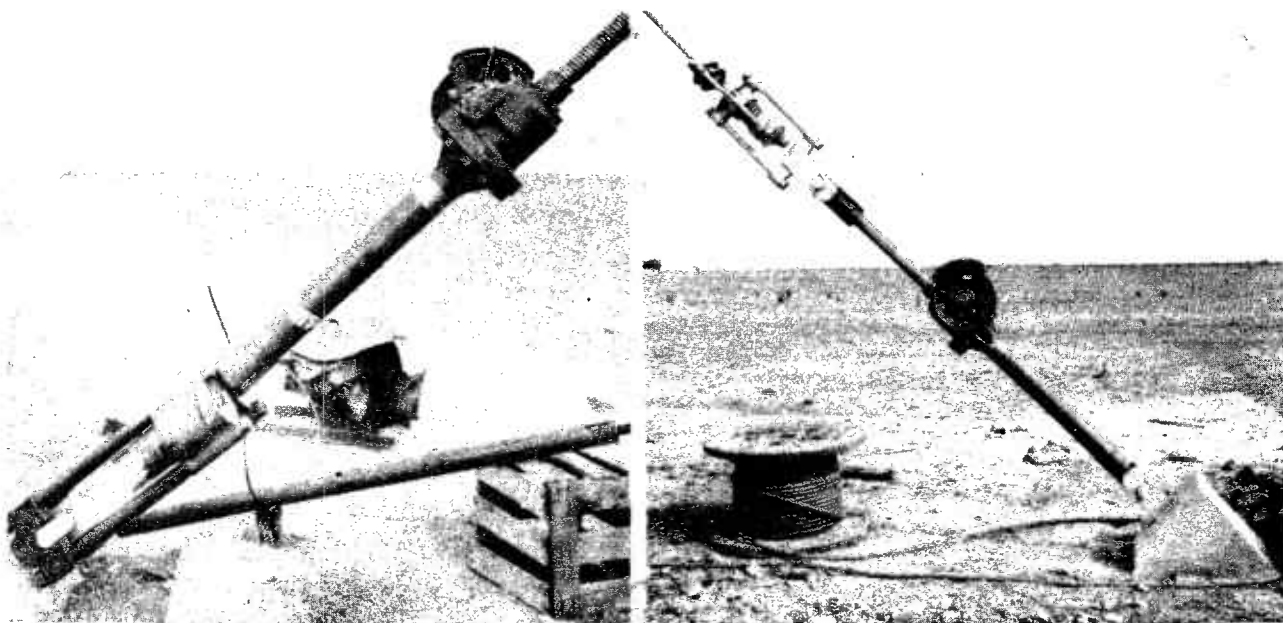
TYPICAL MAST LIGHTING INSTALLATION.
